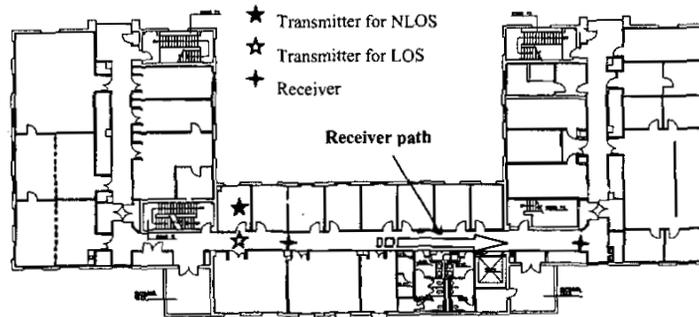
3<sup>rd</sup> floor of Caltech's Moore building (Department of Electrical Engineering)
